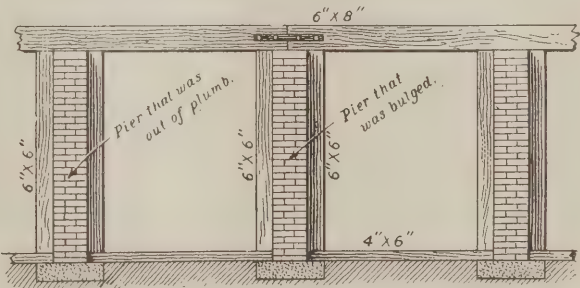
Manner in Which the Brick Piers Were Reinforced.
